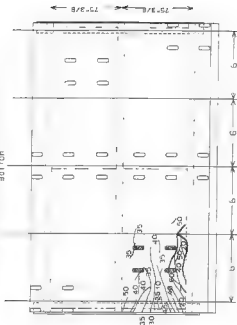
Bottom Cracking Pattern (Fourth Bridge - Test No 7)
